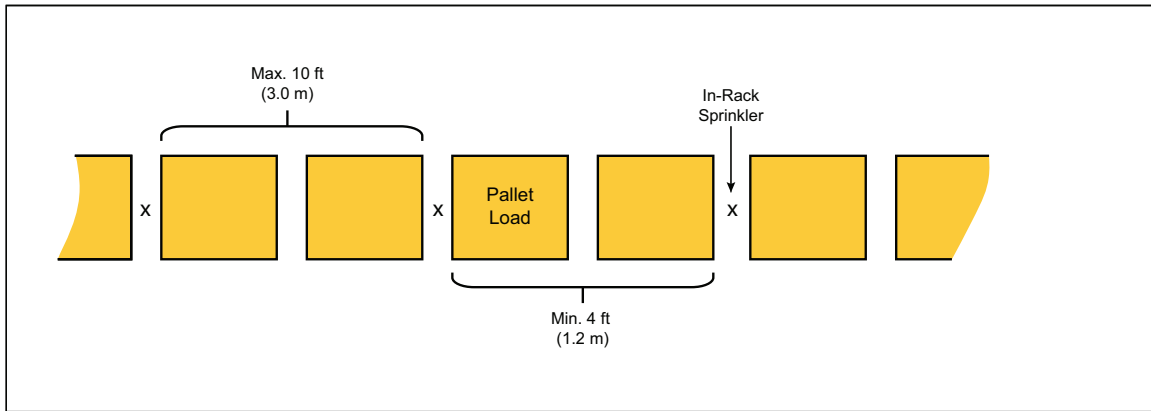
Plan view of IRAS(EO) horizontal in-rack sprinkler arrangement for single-row racks
